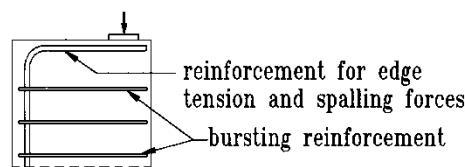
4 illustrates the reinforcement requirements for anchorage zones.
